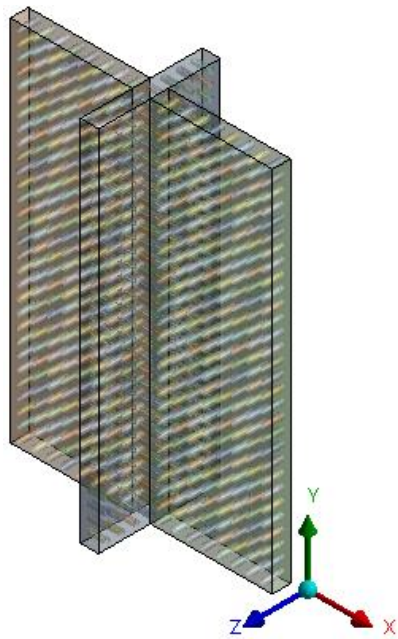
FE model of cross-shaped stainless steel core plate wall.
